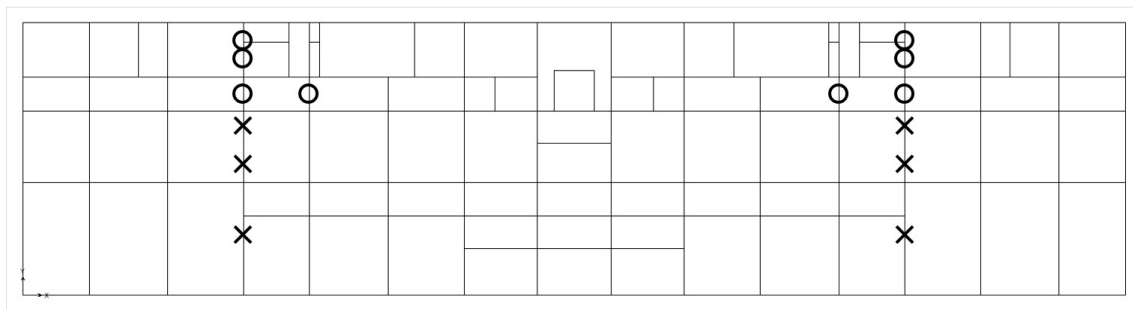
Damper Placement at 4th floor (SR-Y); MSSSA: 8 dampers;
